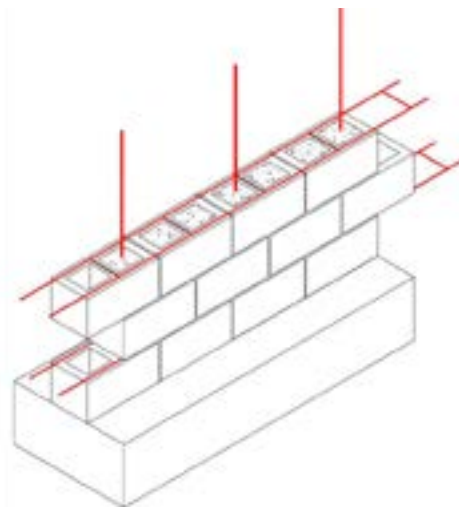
HORIZONTAL AND VERTICAL MASONRY REINFORCEMENT
